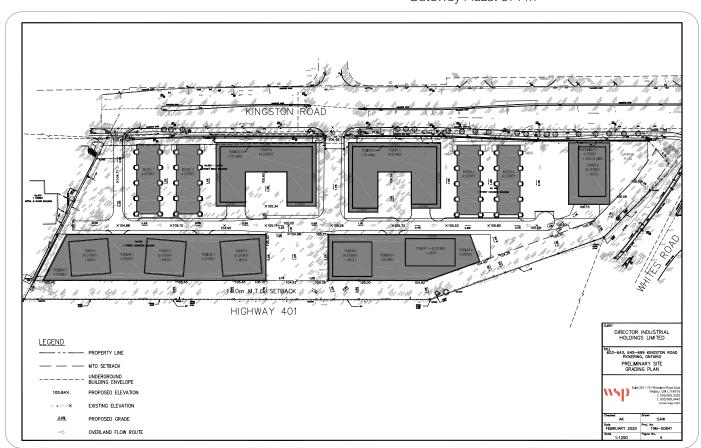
Preliminary Site Grading Plan: Prepared by WSP
